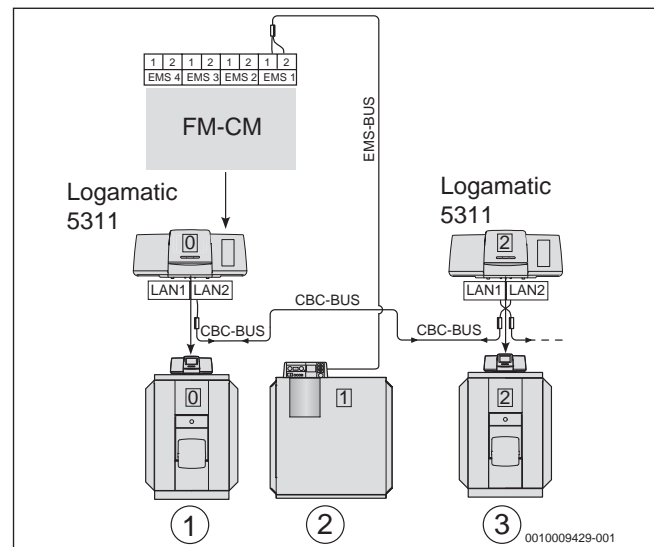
Connecting floor standing boilers with Logamatic 5311
